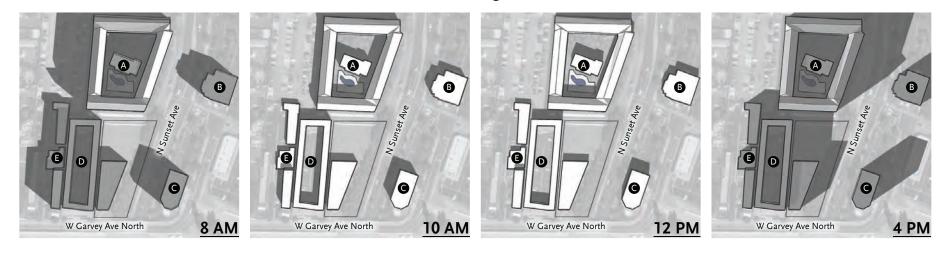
EXISTING & PROPOSED PROJECT FALL EQUINOX SHADOWS
